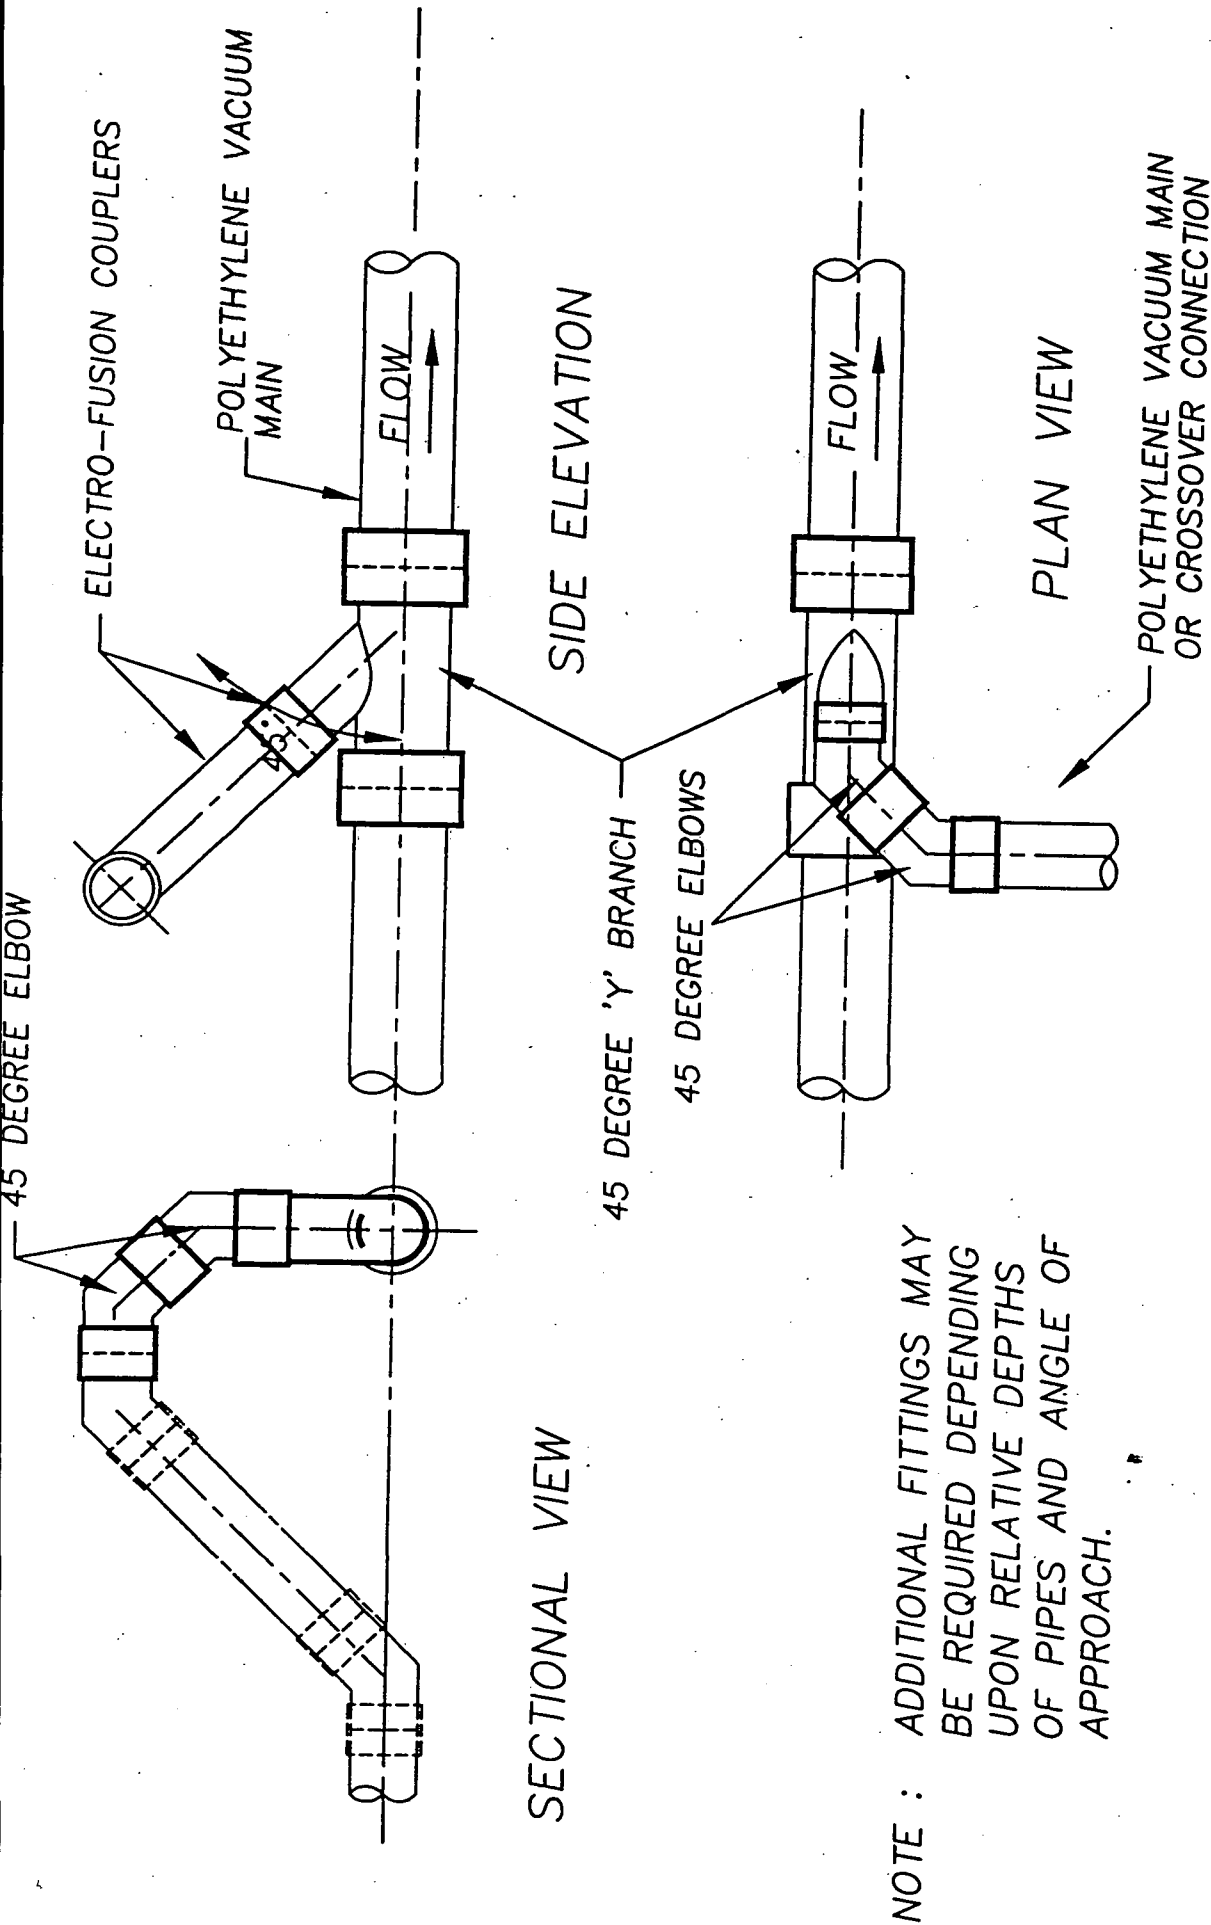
TYPICAL 'Y' BRANCH CONNECTION
